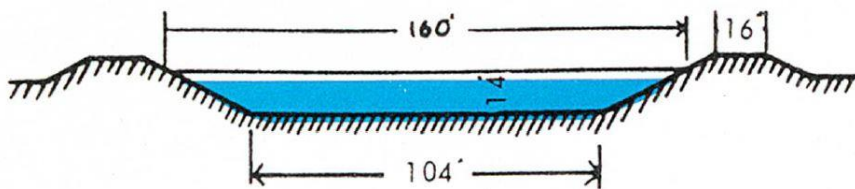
Earthen Embankment Canal Section: Erie Canal – Waterford to Three Rivers
